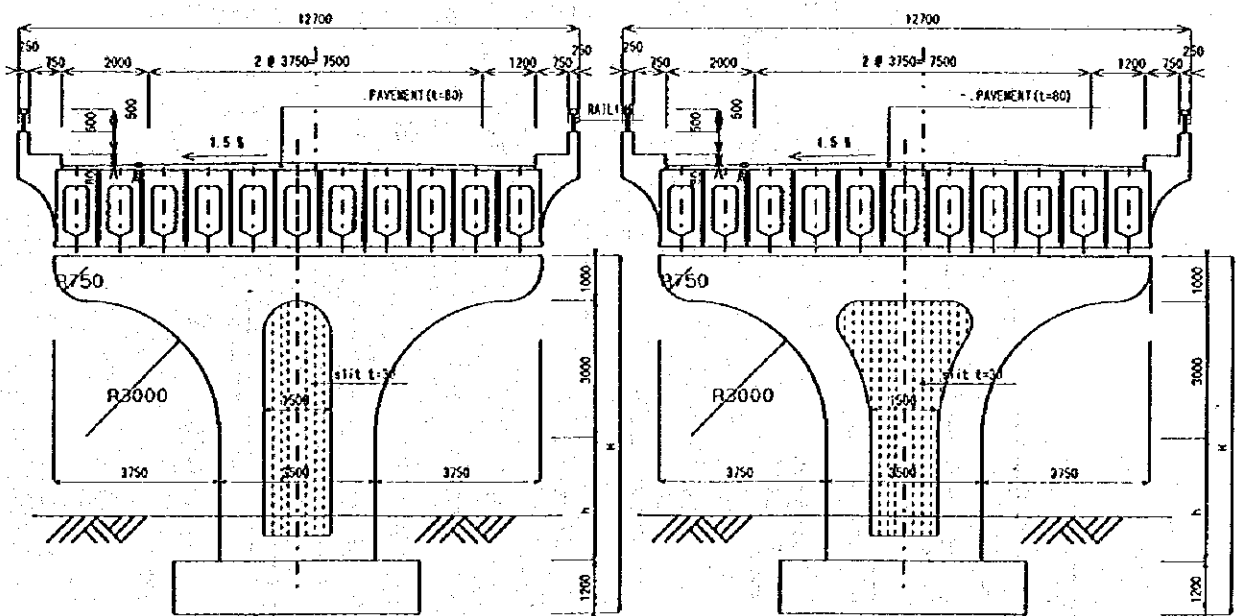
Cross Sectional Details of Super-structure Type-1 with Sub-Structure Type-3
